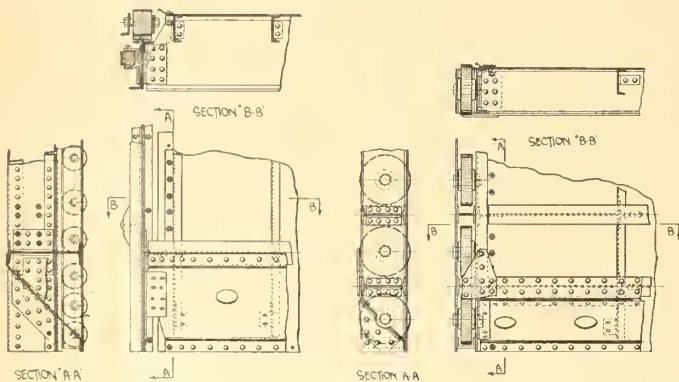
Bottom End of Stoney Roller, and Fixed Roller Types of Gate.
